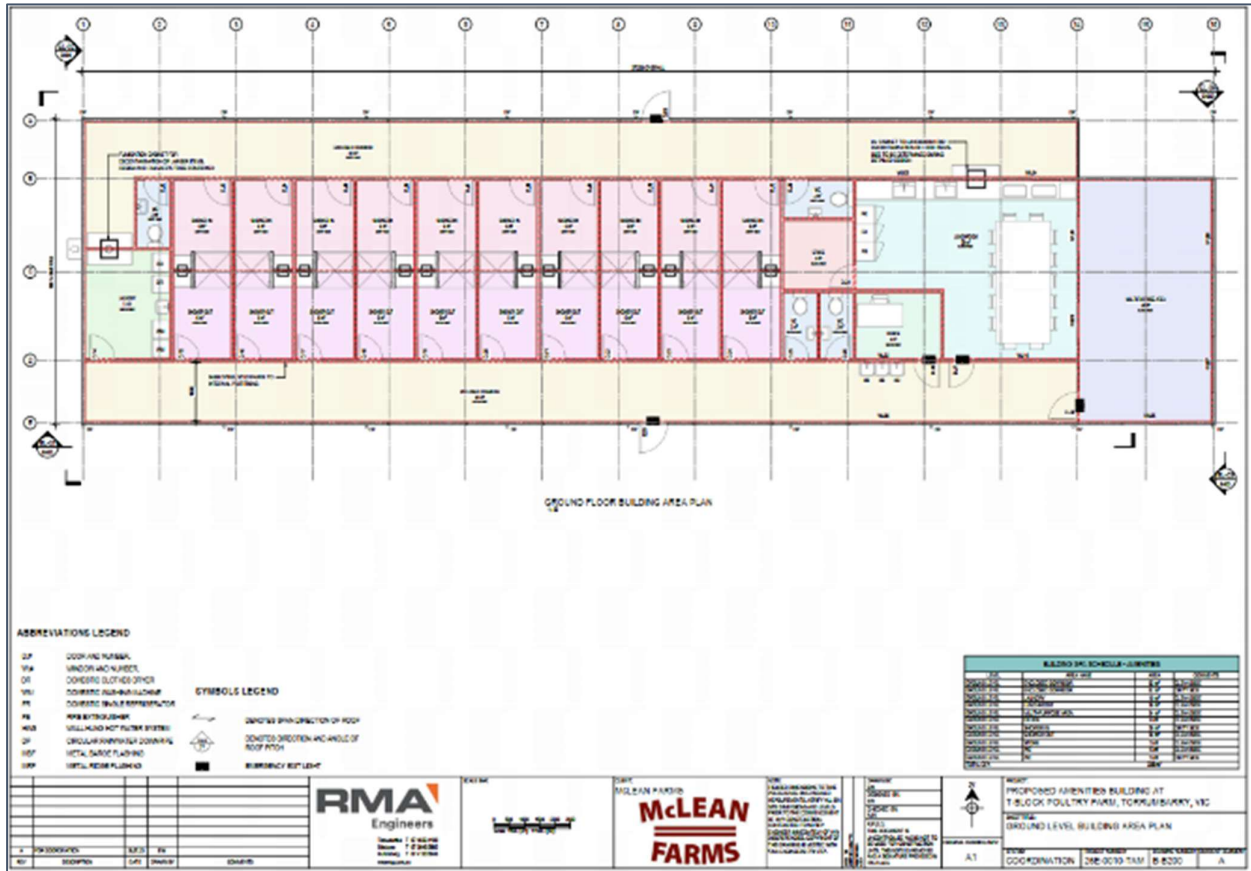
Staff Amenities Building – Floor Plan (RMA Engineers, 2025)
